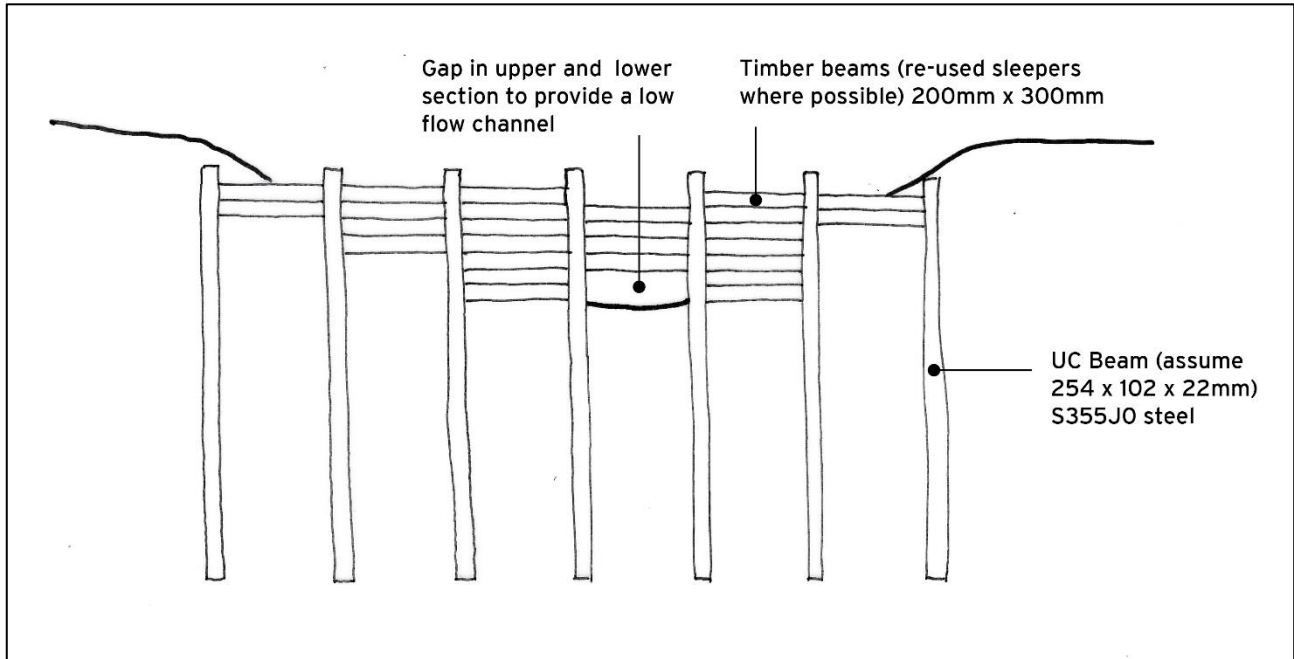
Illustrative concept design of a small dam / barrier formed of piles and timber beams
